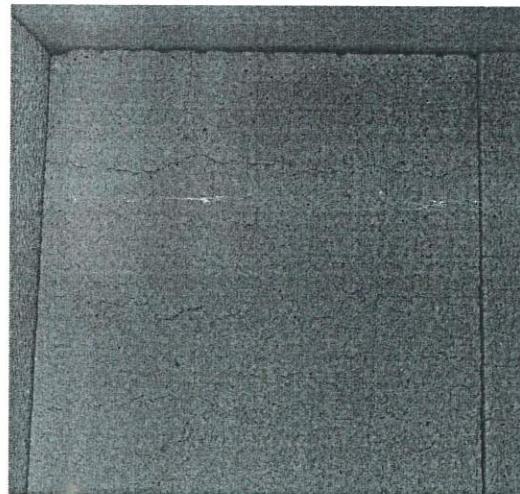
Section of the block wall showing cracks in the concrete blocks.
